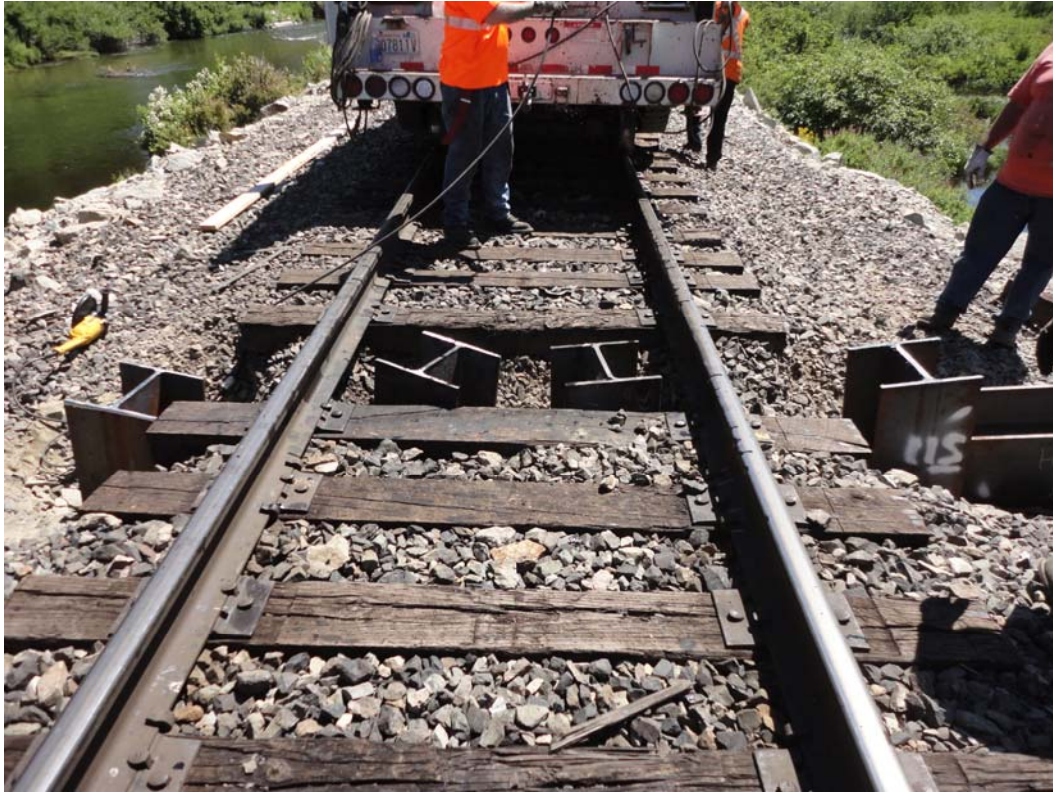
View of Pier 3 Piles 4, 3, 2, 1 (left to right).
